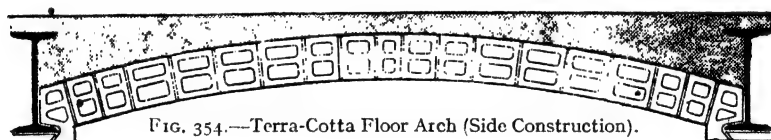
Terra-Cotta Floor Arch (Side Construction).
